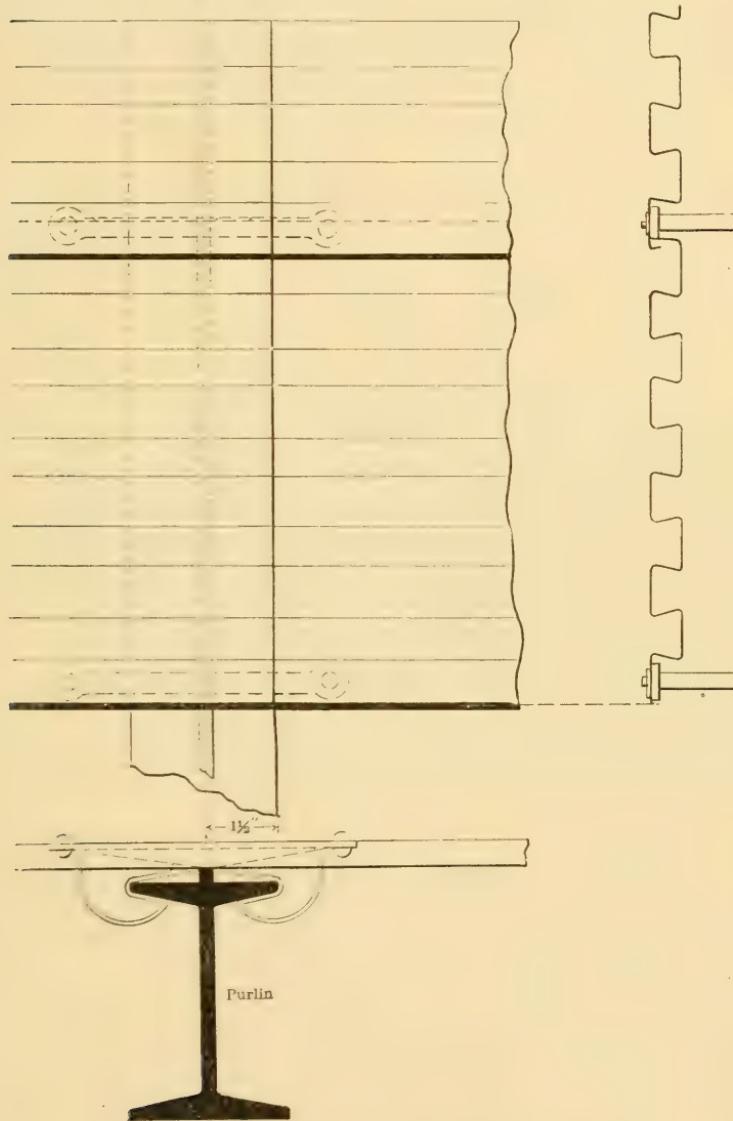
SECTION THROUGH PURLIN AND FERROINCLAVE.
